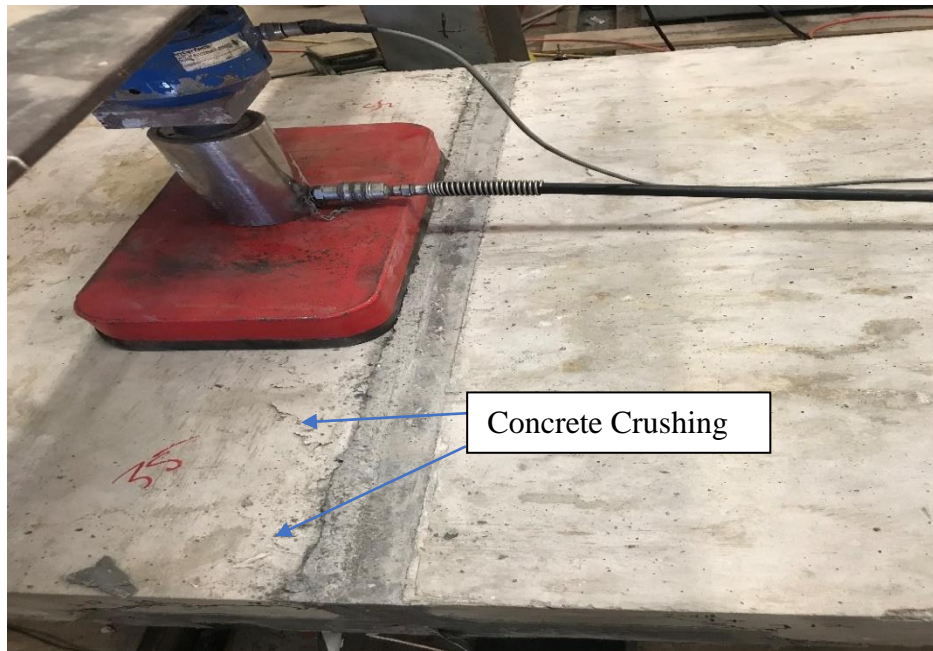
Concrete crushing at the top of Ductal® slab 1 indicating failure
